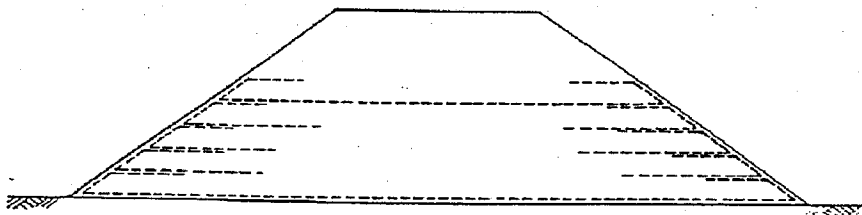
Geosynthetics as stabilizing reinforcement for an embankment on soft ground
